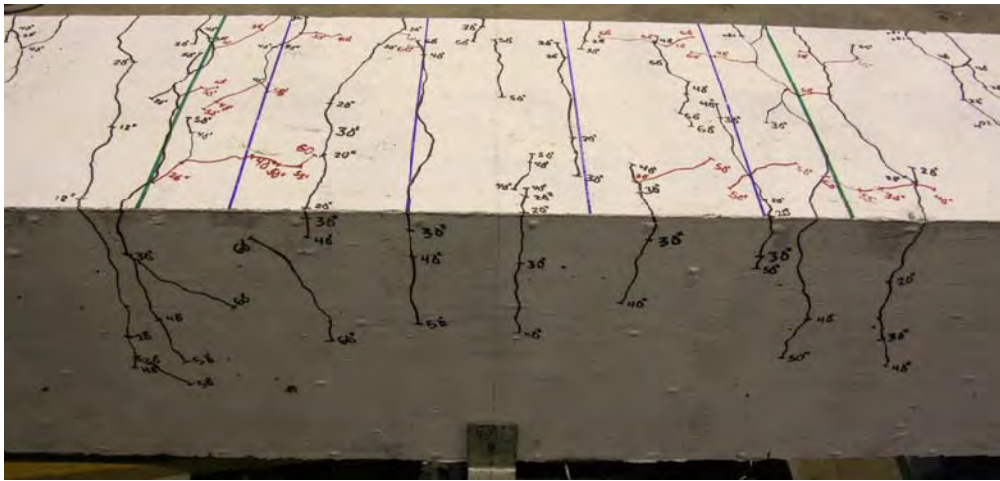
Photo. Side and top face of Beam C11-ST before failure.
